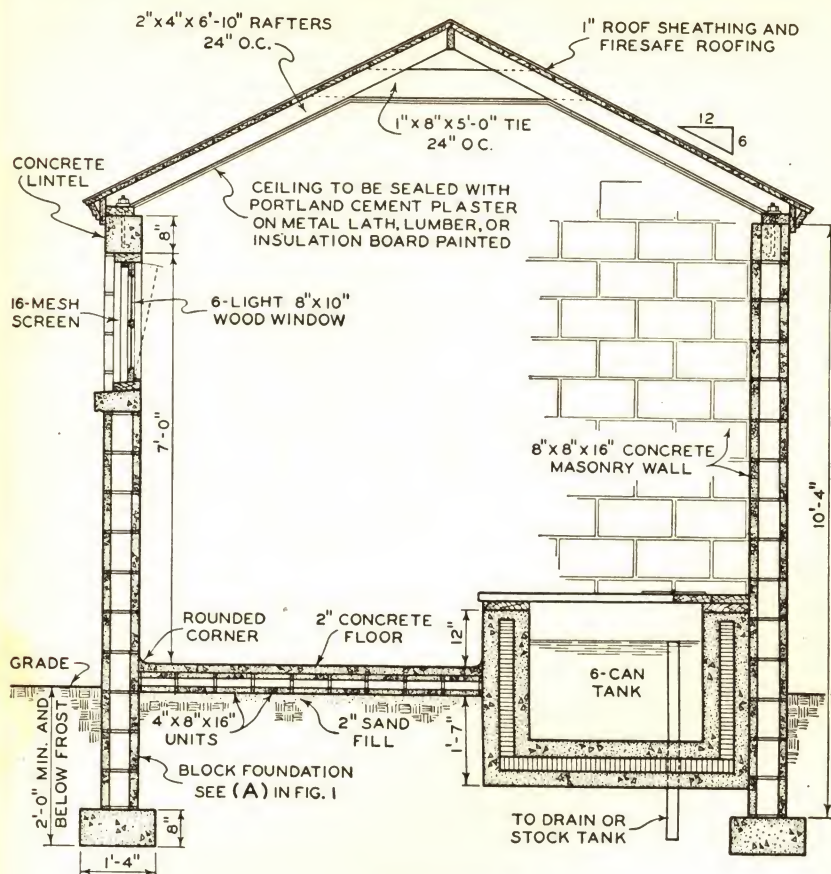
A. One-Room Milkhouse Constructed of Concrete Masonry
